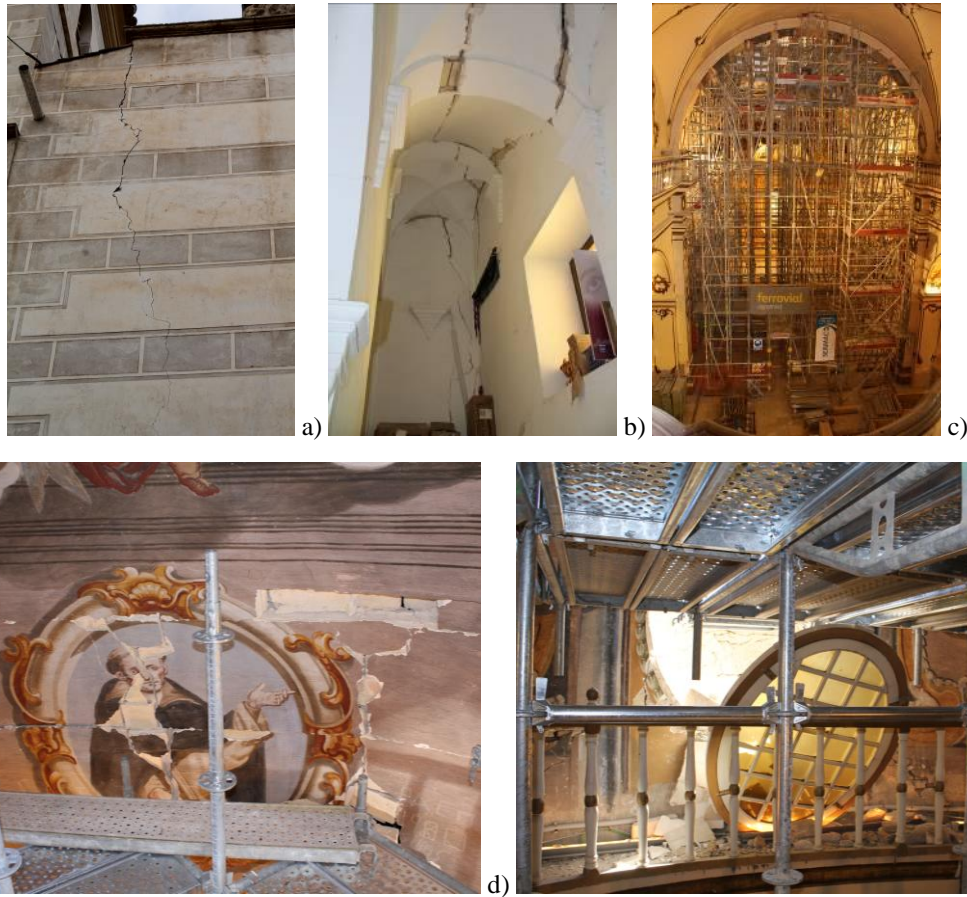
Damages to I3 showing cracking in the façade (a) and in the interior walls and arches (b), emergency shoring of the dome (c), and damages to the dome (d) and (e).
